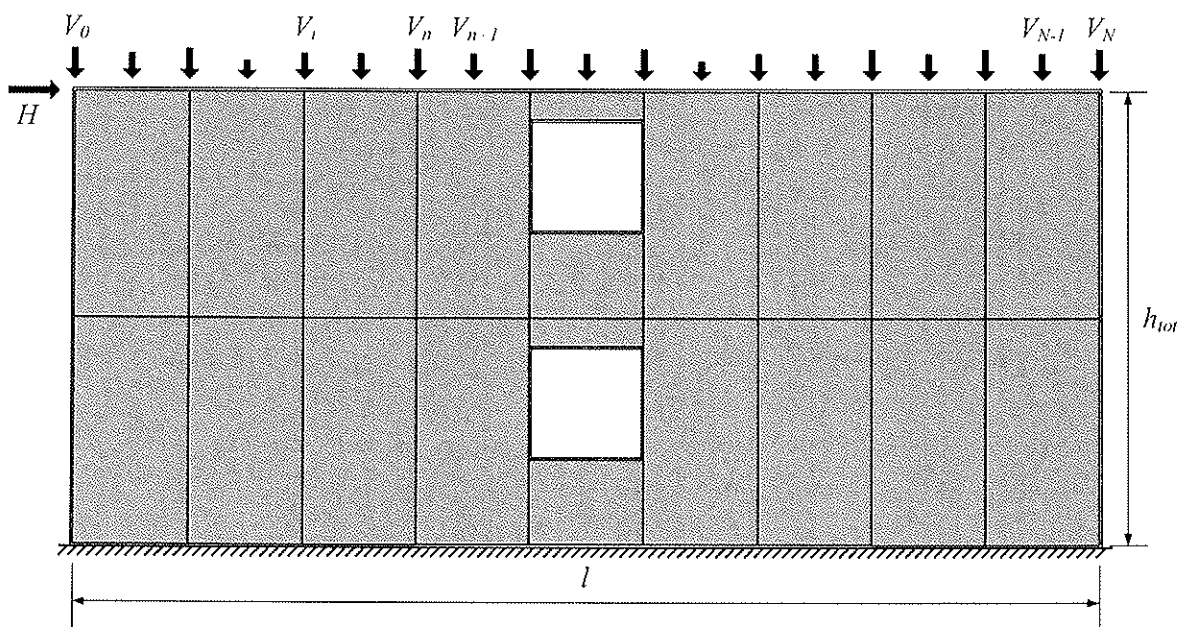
Forces acting on a two-storey wall diaphragm with openings and fully anchored bottom rail.
